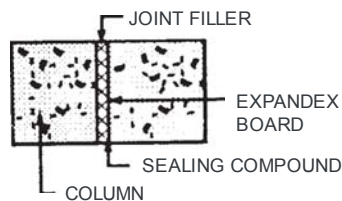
Typical Details of Expansion Joint at Isolated Twin Columns
